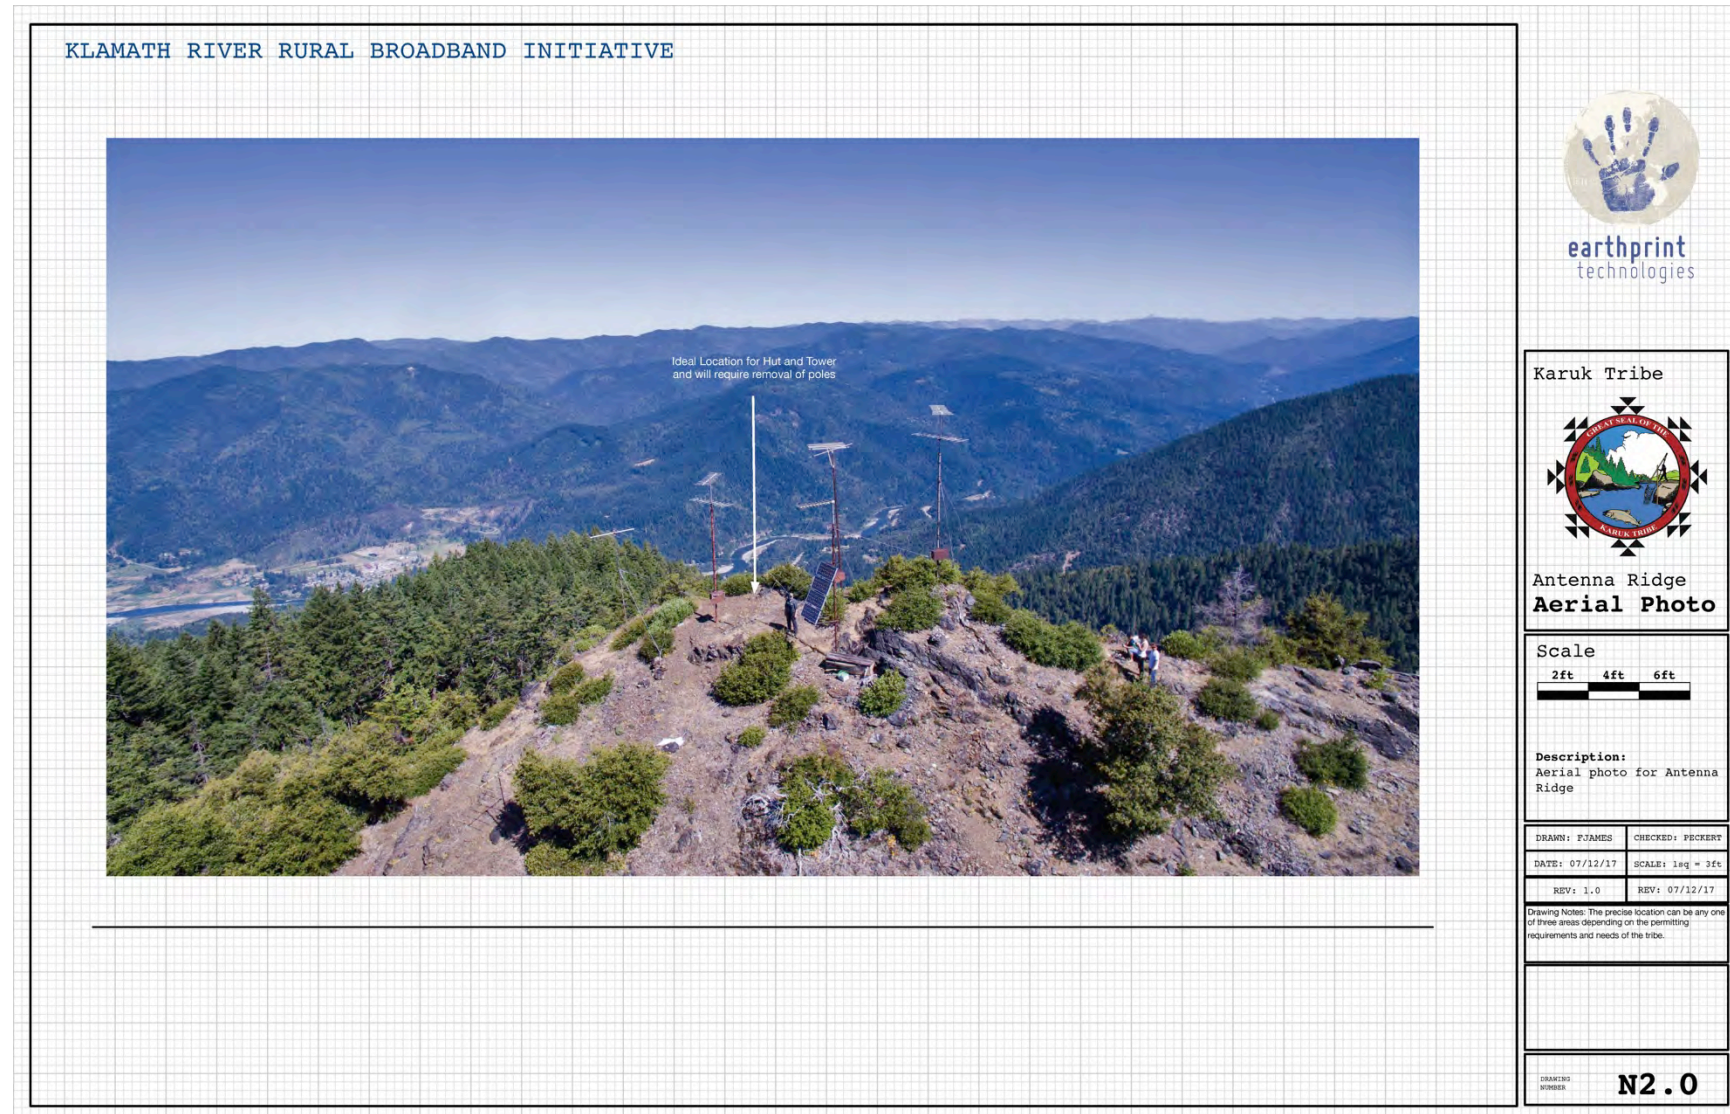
Yurok Signal Connection, Antenna Ridge Aerial Photo
